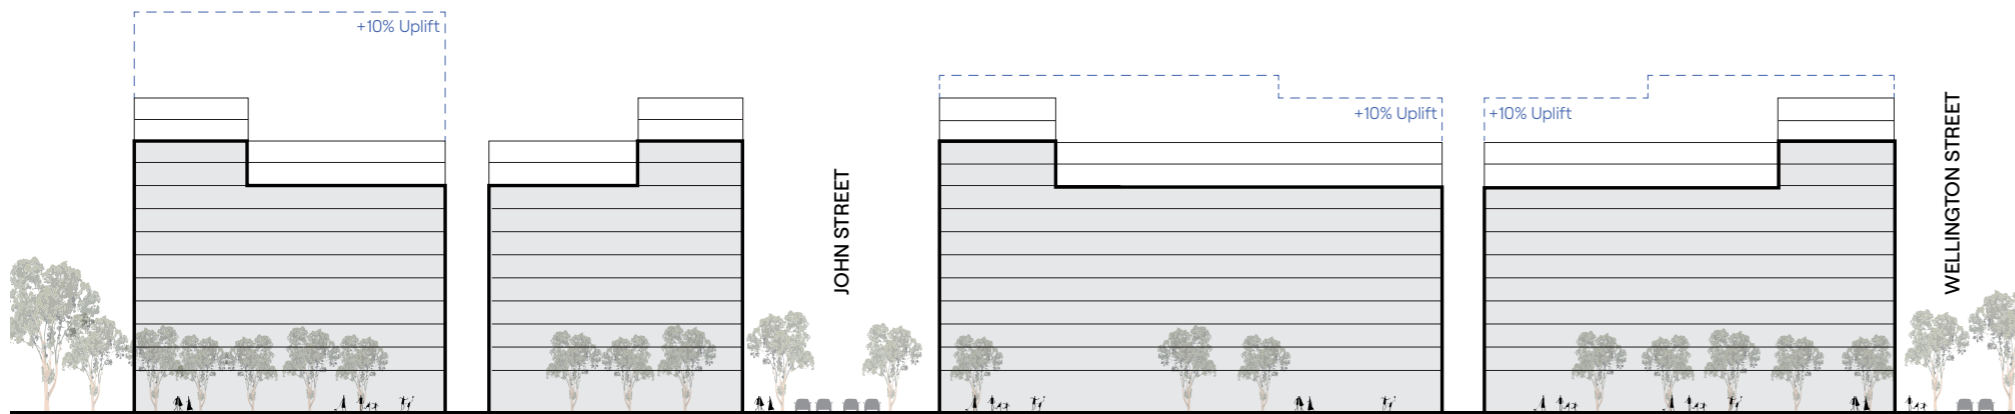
2022 Design Guide 9-11 storey street wall. 10% uplift shown as dashed.
